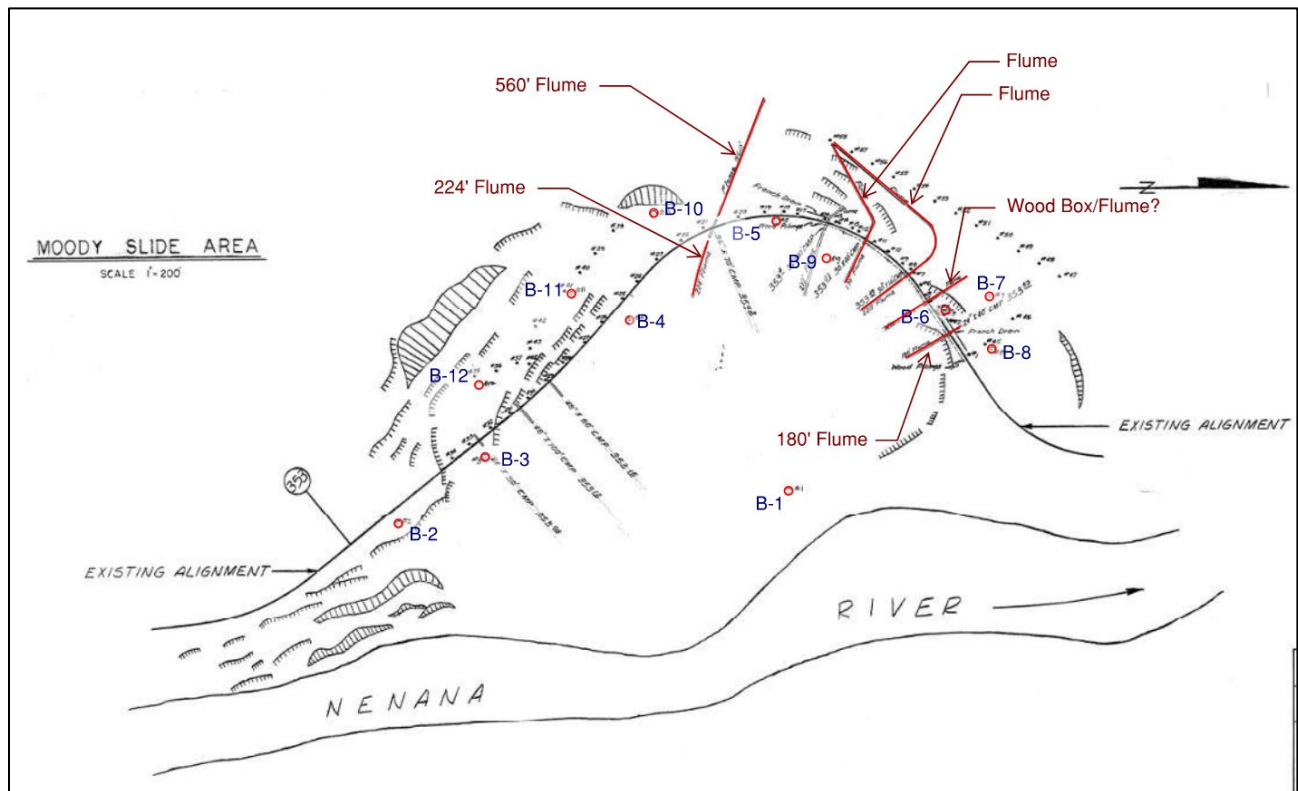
1968 Site Plan and "Deep" Boring Locations
